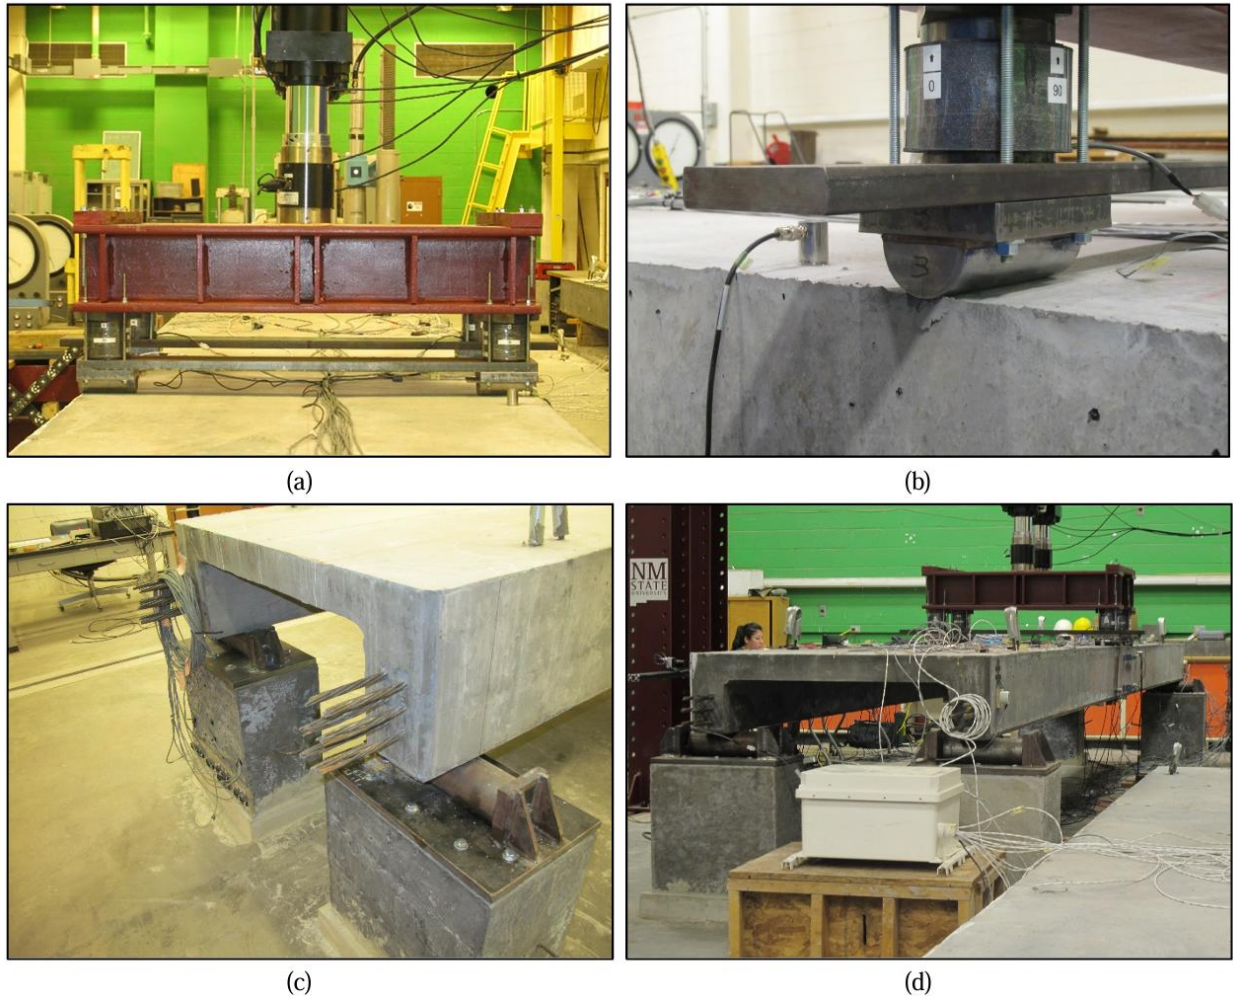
Test set up - a) hydraulic actuators and spreader beam assembly; b) load cells and loading point; c) reinforced concrete short columns with steel cap and roller support; d) fully instrumented girder test set up; (UHPC Phase III, Figure 8.34)
